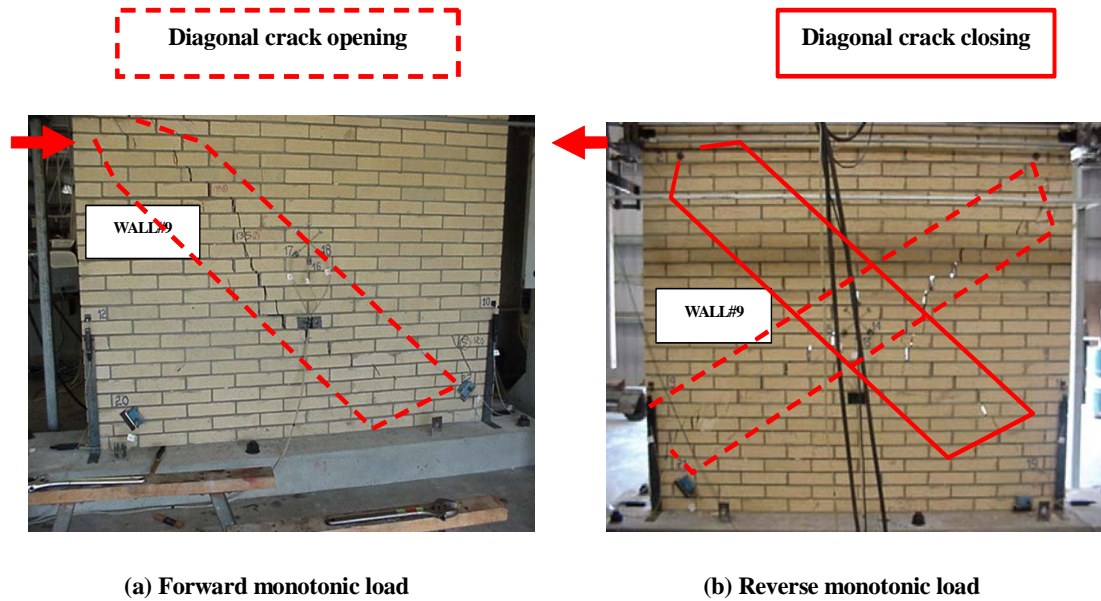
Final crack pattern of ECRM wall tested under monotonic loading
